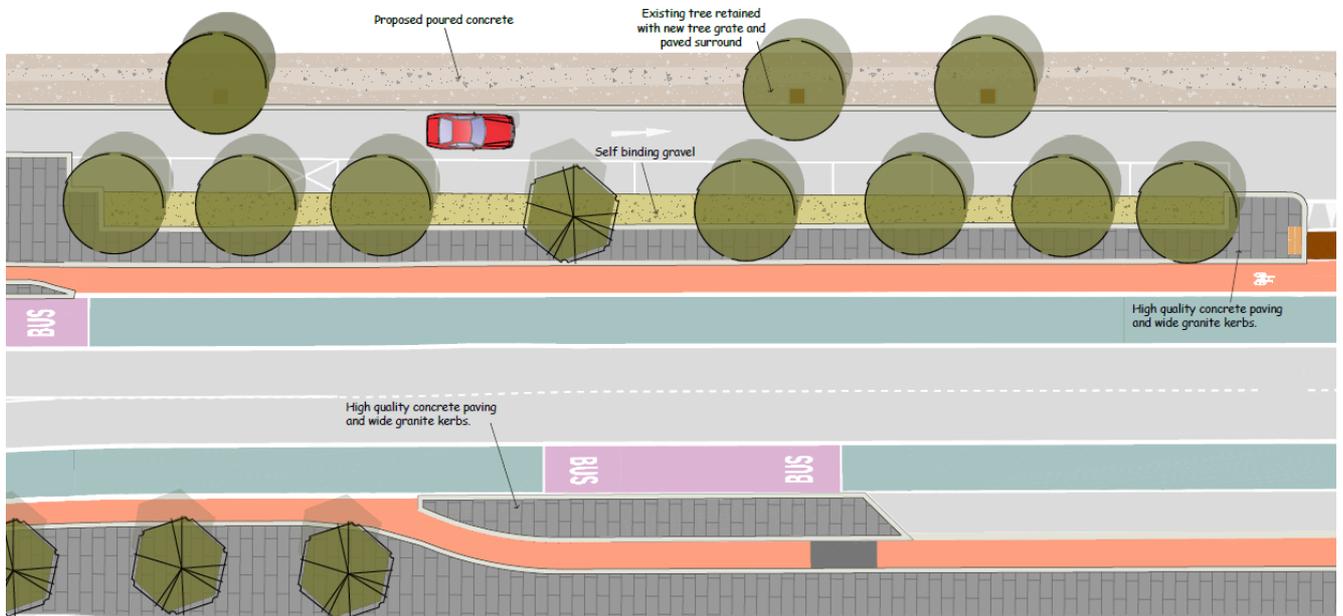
House No. 370 to No. 352 Ballyfermot Road
